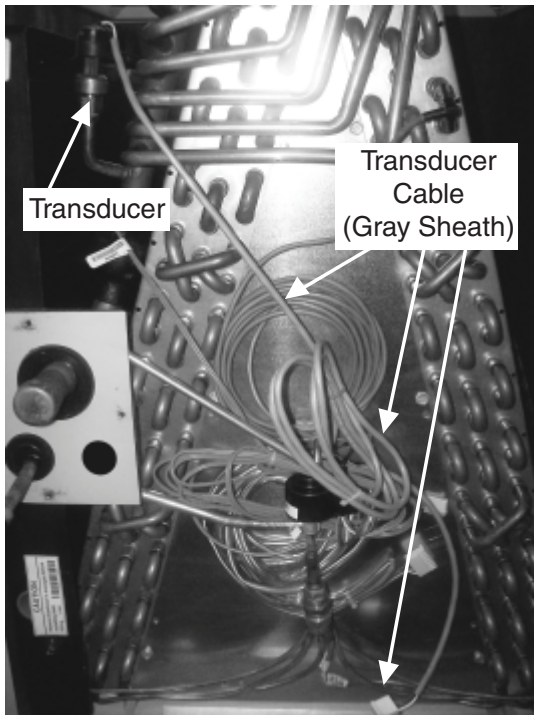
Pressure Transducer and Cable in iQ Drive® coil Assembly 919230E
